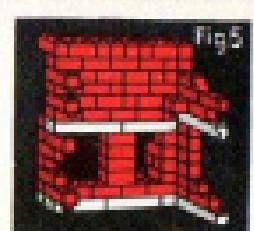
Detail of lower portion of Tower wall inside building. Half brick "D" is shown diagonally and Fig. 4 shows the outside or outer portion of this section.
